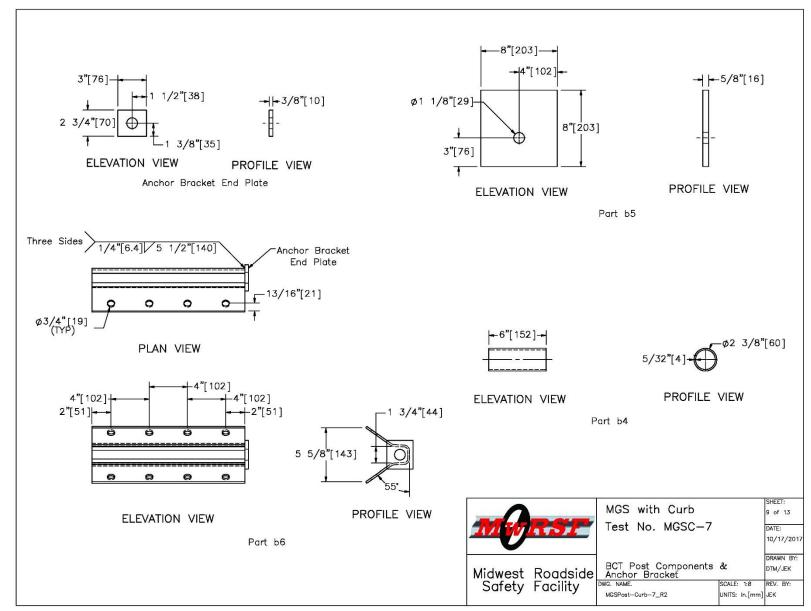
BCT Post Components and Anchor Bracket, Test No. MGSC-7
